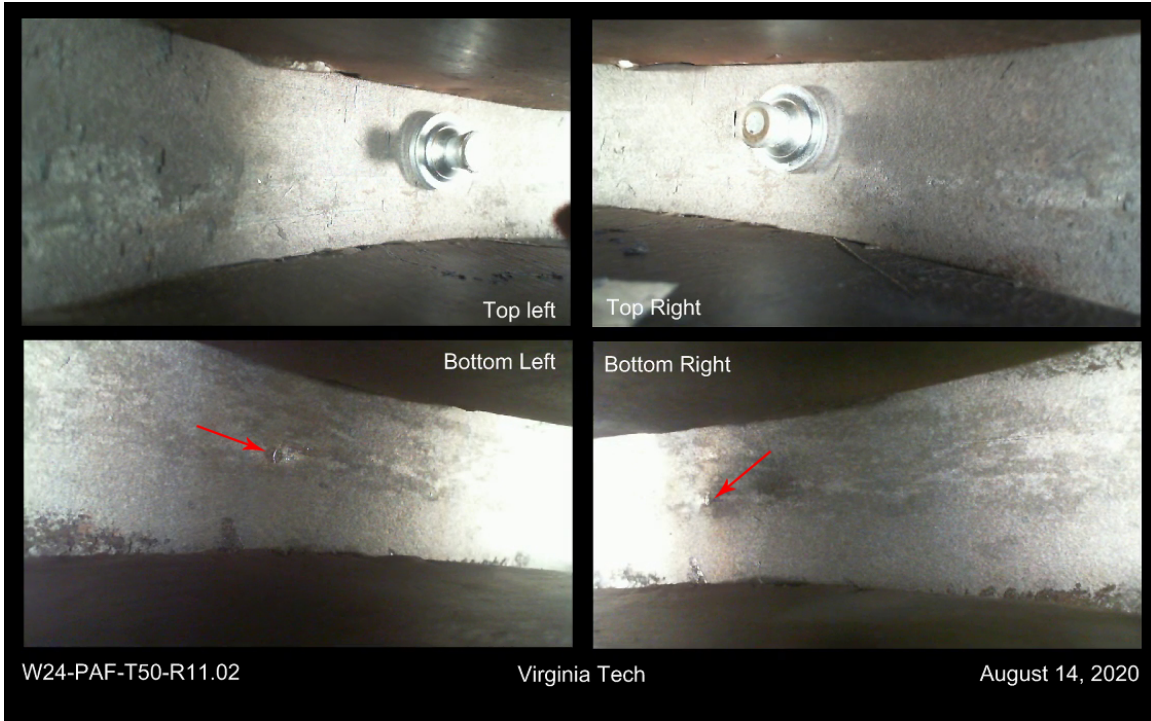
Fracture initiation of W24-PAF-T50-R11.01.
